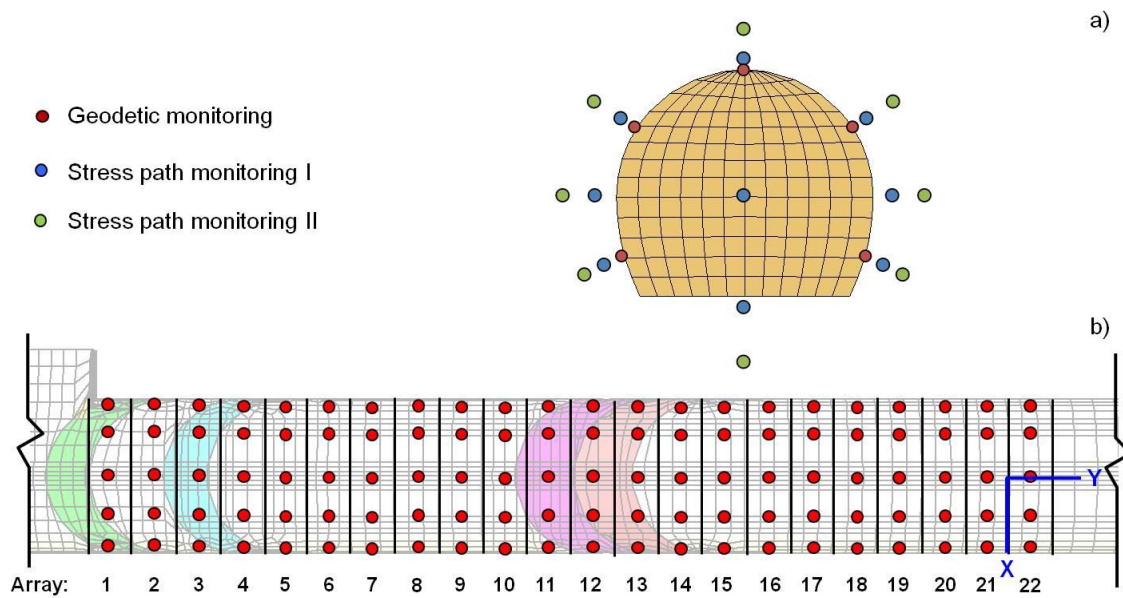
Layout of the stress and displacement monitoring setup along Section 3. a) Vertical cross-section showing the location of the monitoring points around the tunnel boundaries. b) Longitudinal horizontal cross-section showing the location of the monitoring arrays along the tunnel axis with respect to the implemented fault zones.
